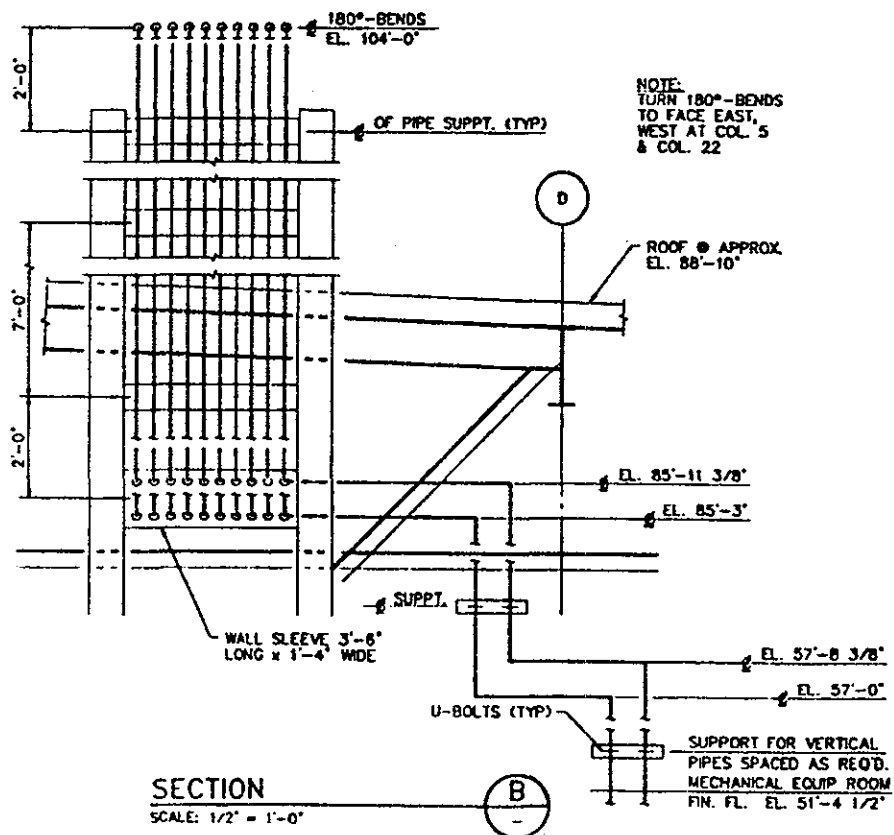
Dimensioning of Overhead-Supported Pipes
